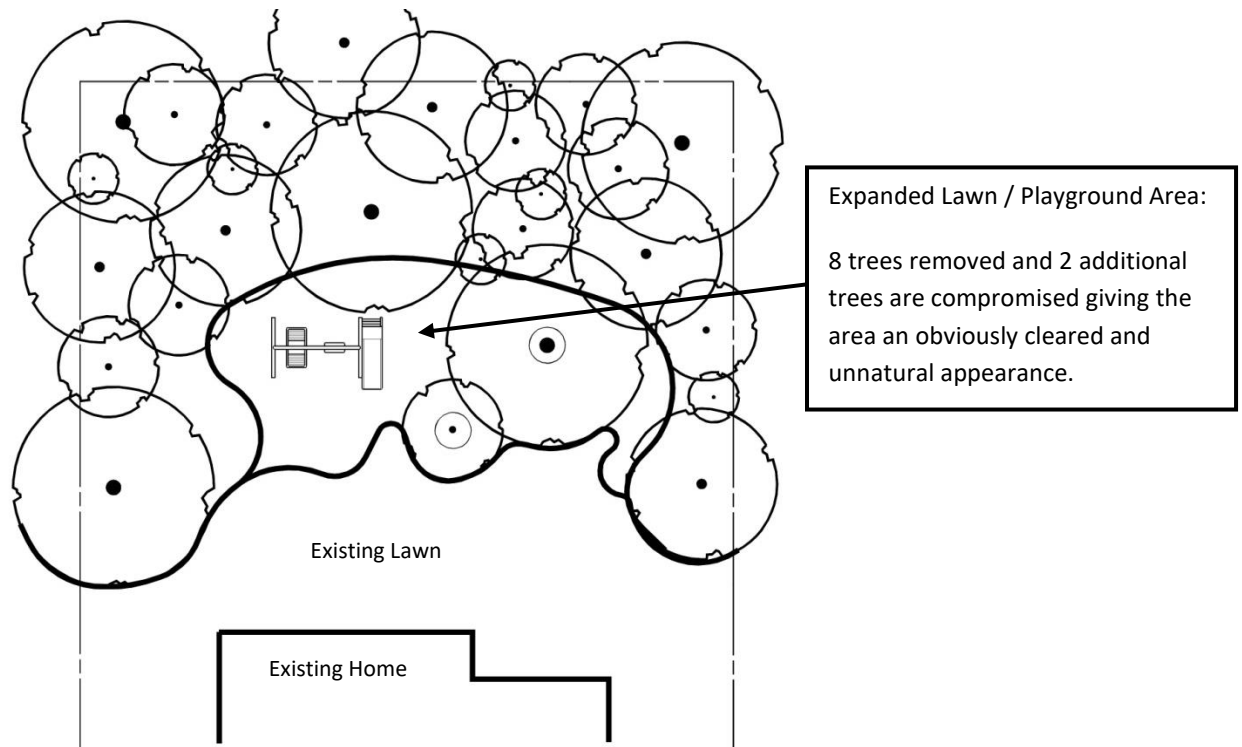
Exhibit B – Example of an unacceptable tree removal proposal to create a playground area
